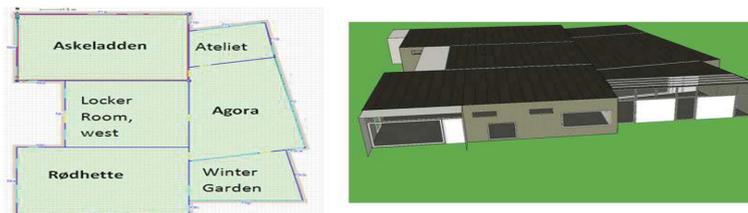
(a) a plan drawing of the school building as it appears from the south façade in IDA ICE; (b) A 3D view
